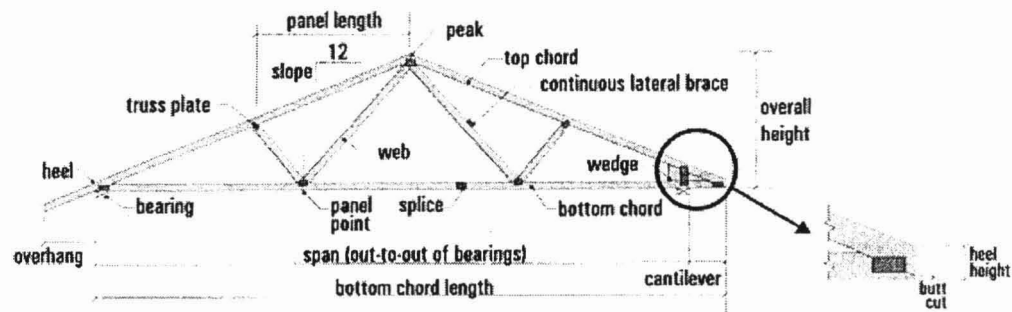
Parts of a Roof Truss (source: [www.arttruss.com](http://www.arttruss.com) 2007)
